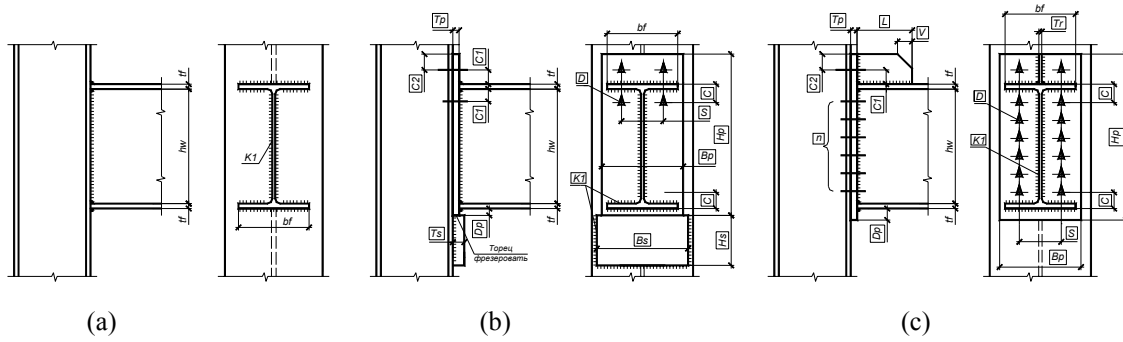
Structural designs for the rigid beam-to-column joints
